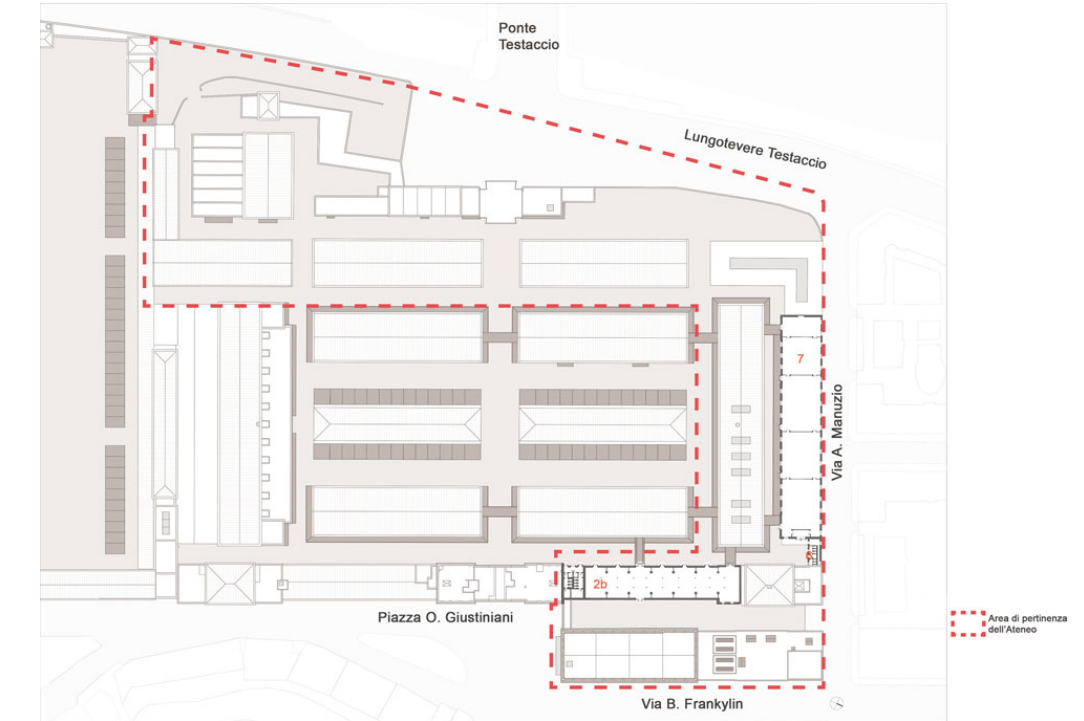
University di Roma Tre redevelopment site plan on the north and west sides of the Mattatoio di Testaccio (in the slaughterhouse complex).
